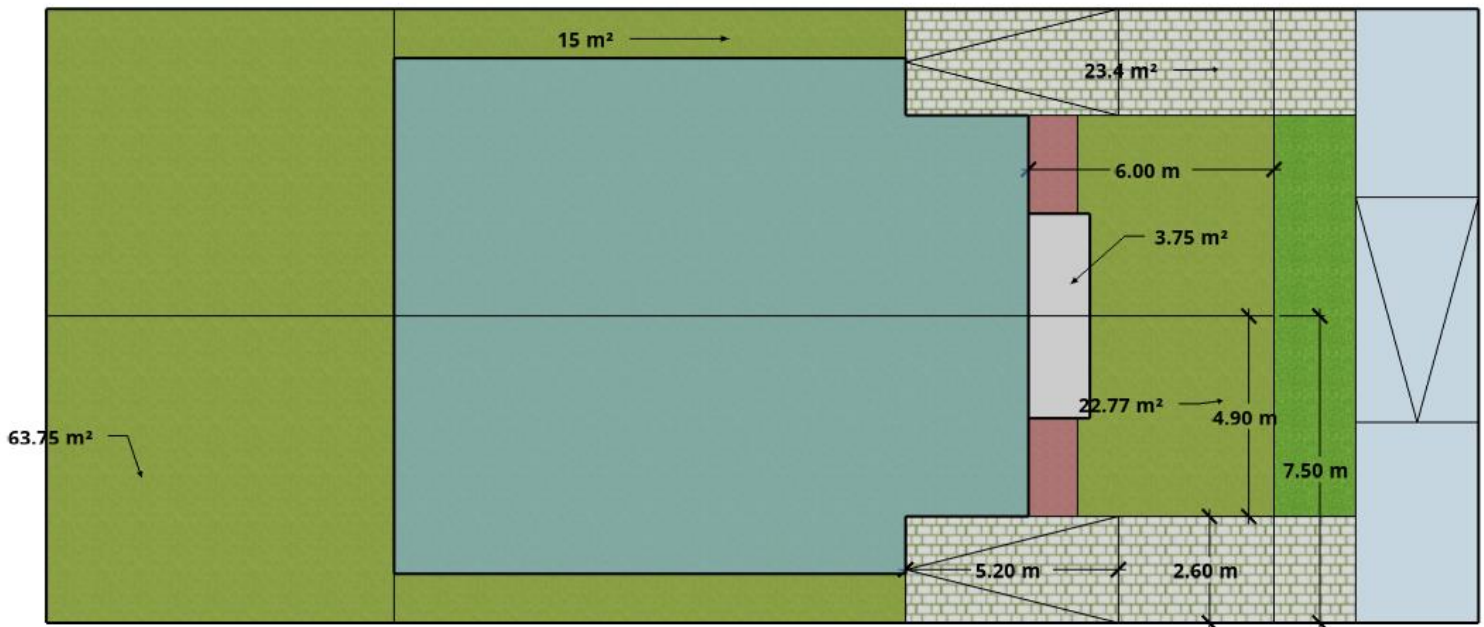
shows one front yard parking space per dwelling unit located at the outer edges of the original lot, along the non-common interior side lot lines. A path between the top of the space and the dwelling unit provides pedestrian access. Walkways are not necessary and are proposed to be prohibited back from the right-of-way to the entry.
